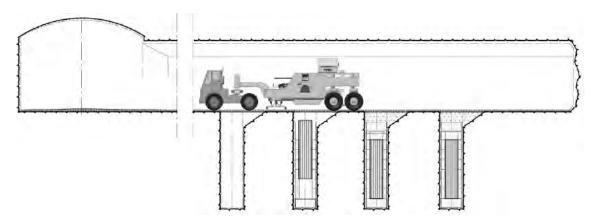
Illustration of the intersection of a main tunnel and a deposition tunnel together with the equipment for installation of canisters (given by SKB).
